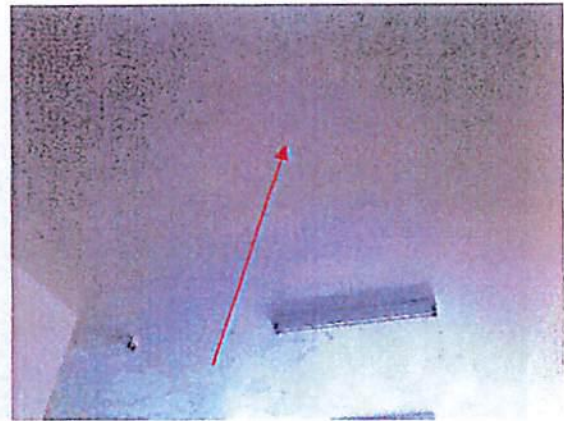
View of plaster ceiling skim coat (HA-E) in various areas of the building.
